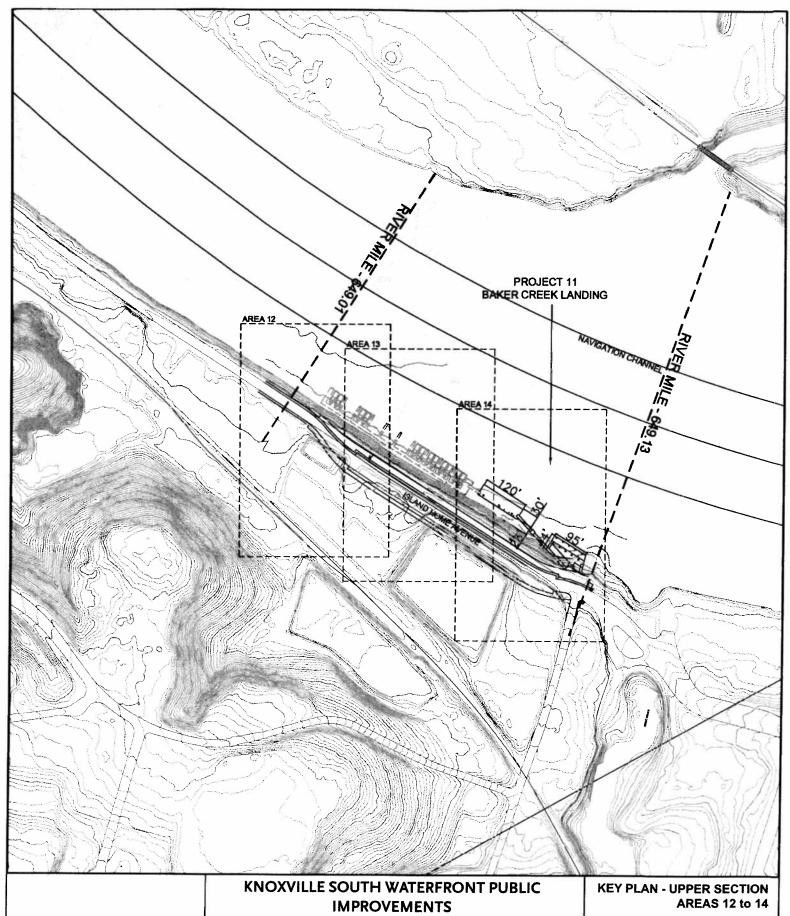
EXHIBIT E FILE NO. 200800886 P.N. NO. 08-51 TVA SECTION 26A/ USACE SECTION 404 JOINT PERMIT APPLICATION
